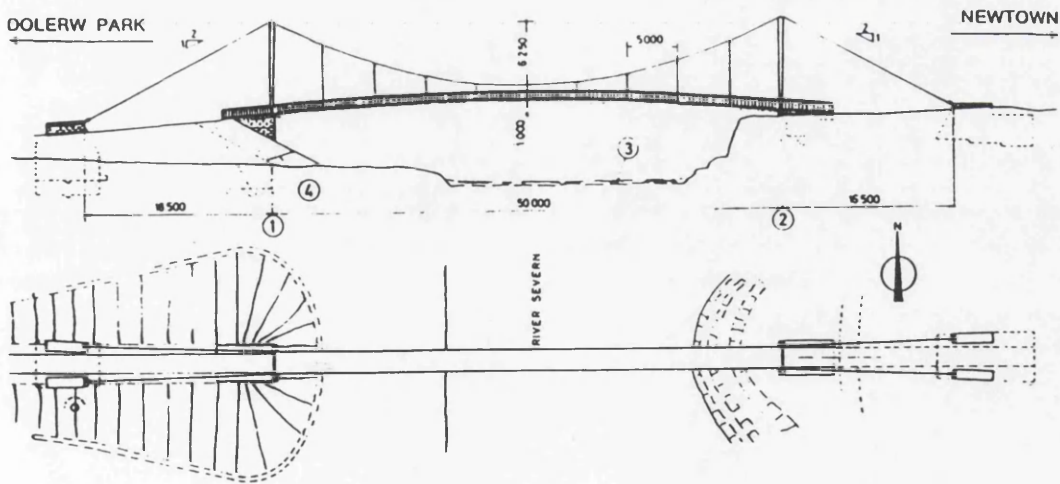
Elevation and plan of the Dolerw bridge.
